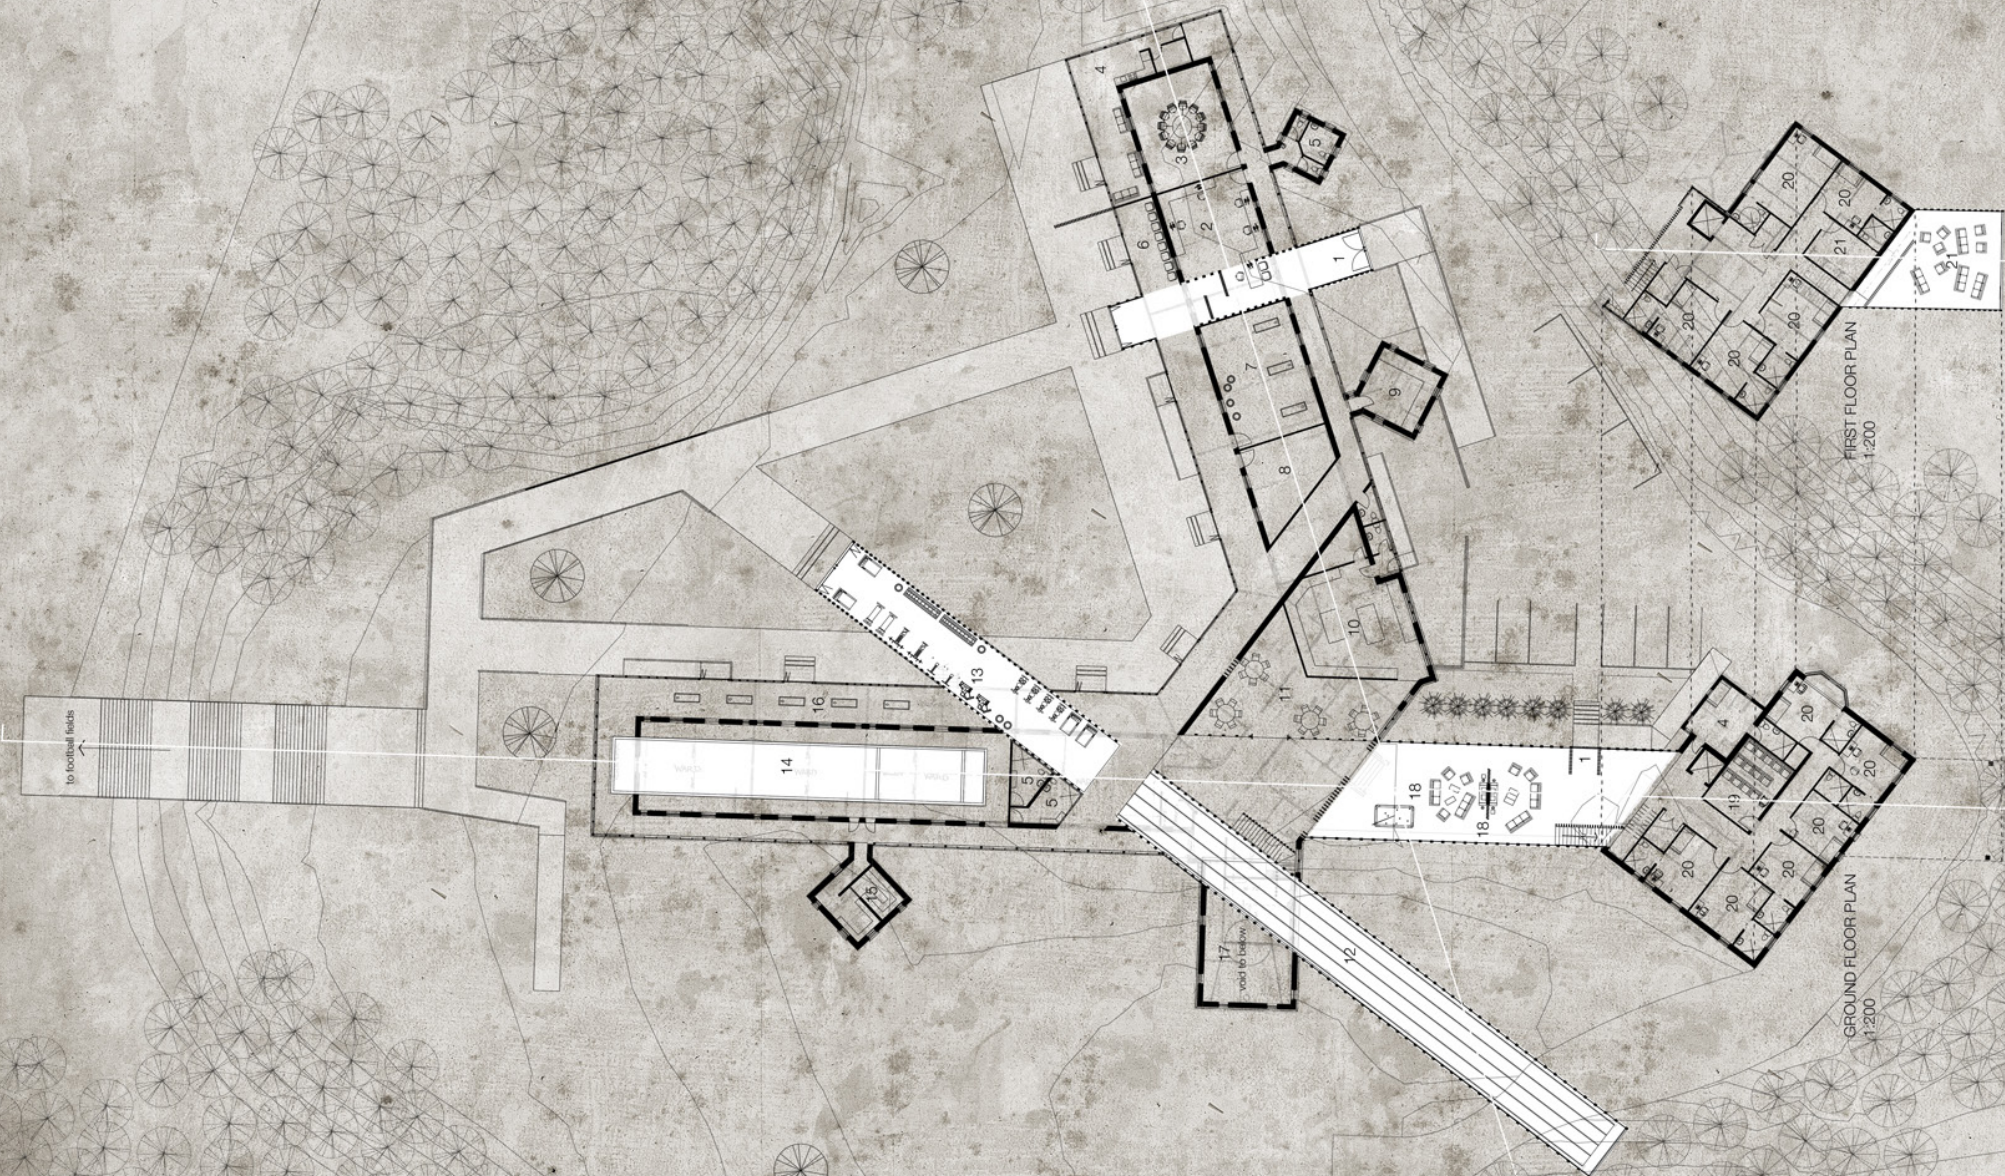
Floor Plan, not to scale, 1:200 @ A1.
